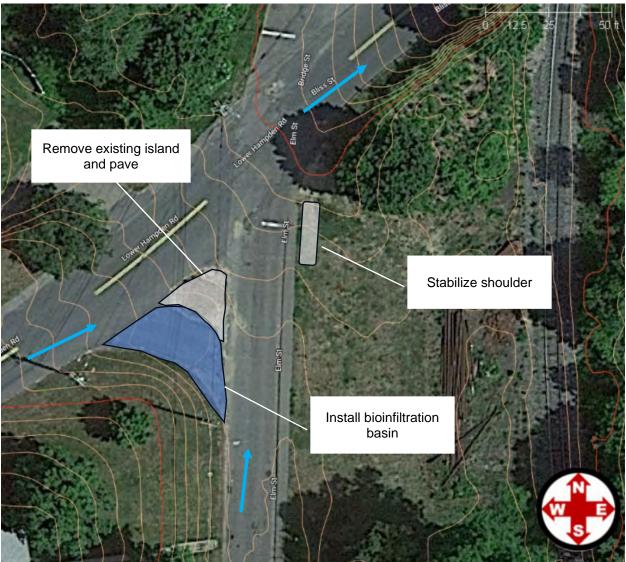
Potential BMP at Elm Street and Lower Hampden Road
